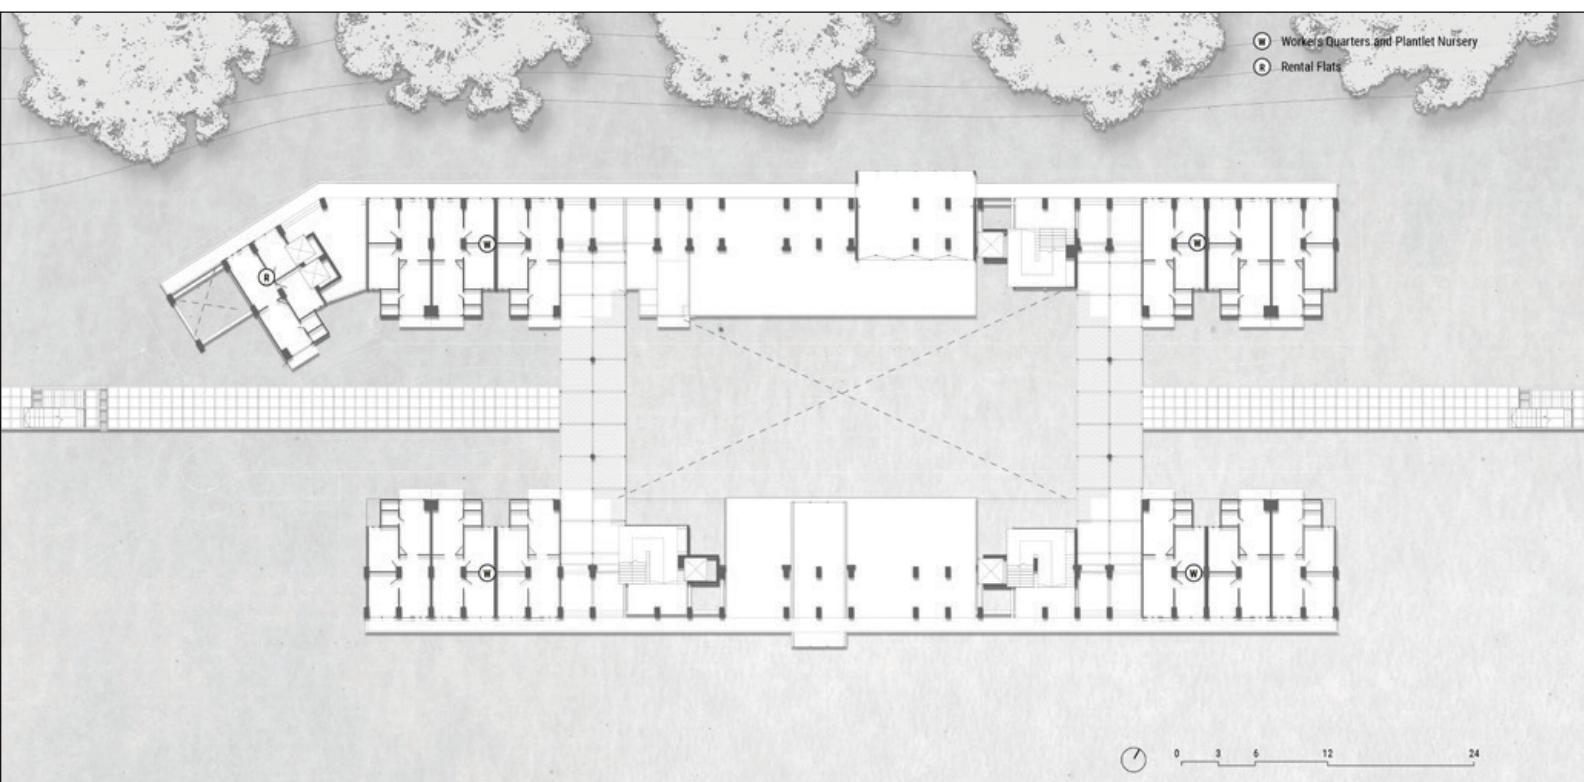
Second Storey Floor Plan - Linkway and Atrium
